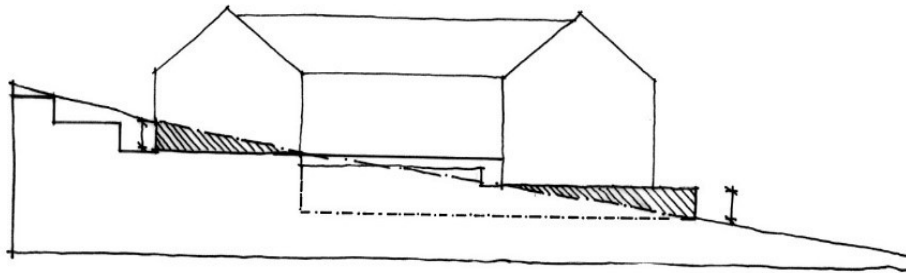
Section illustrating building with stepped ground floor level and possible basement
